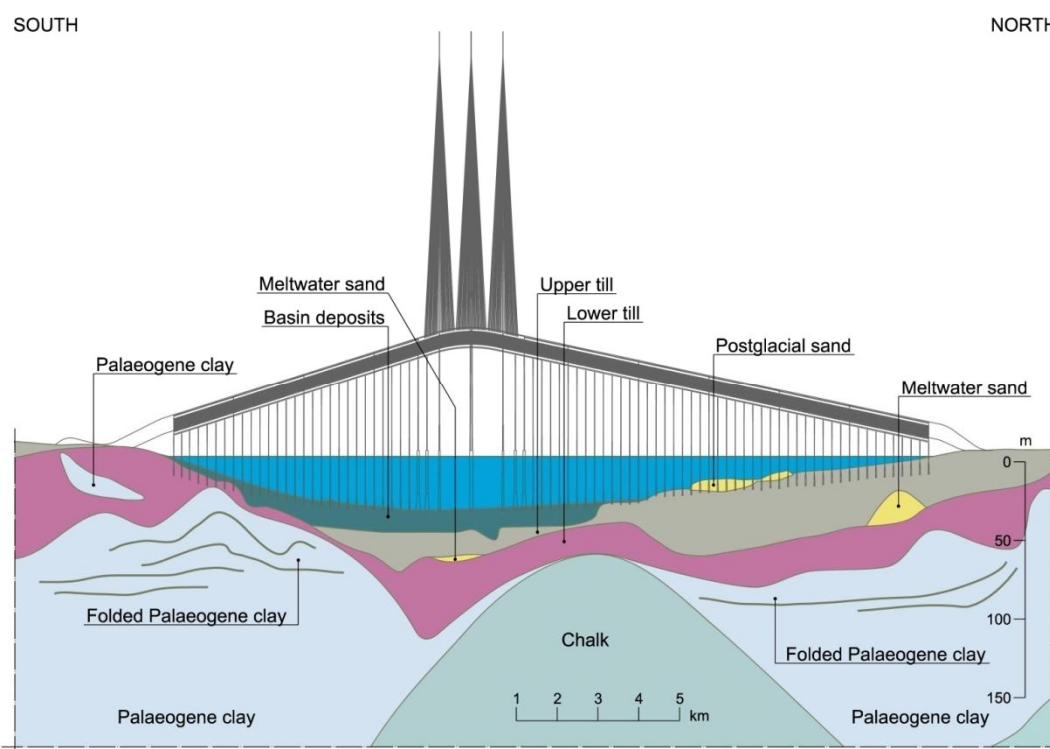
General overview of soil conditions along the bridge alignment
